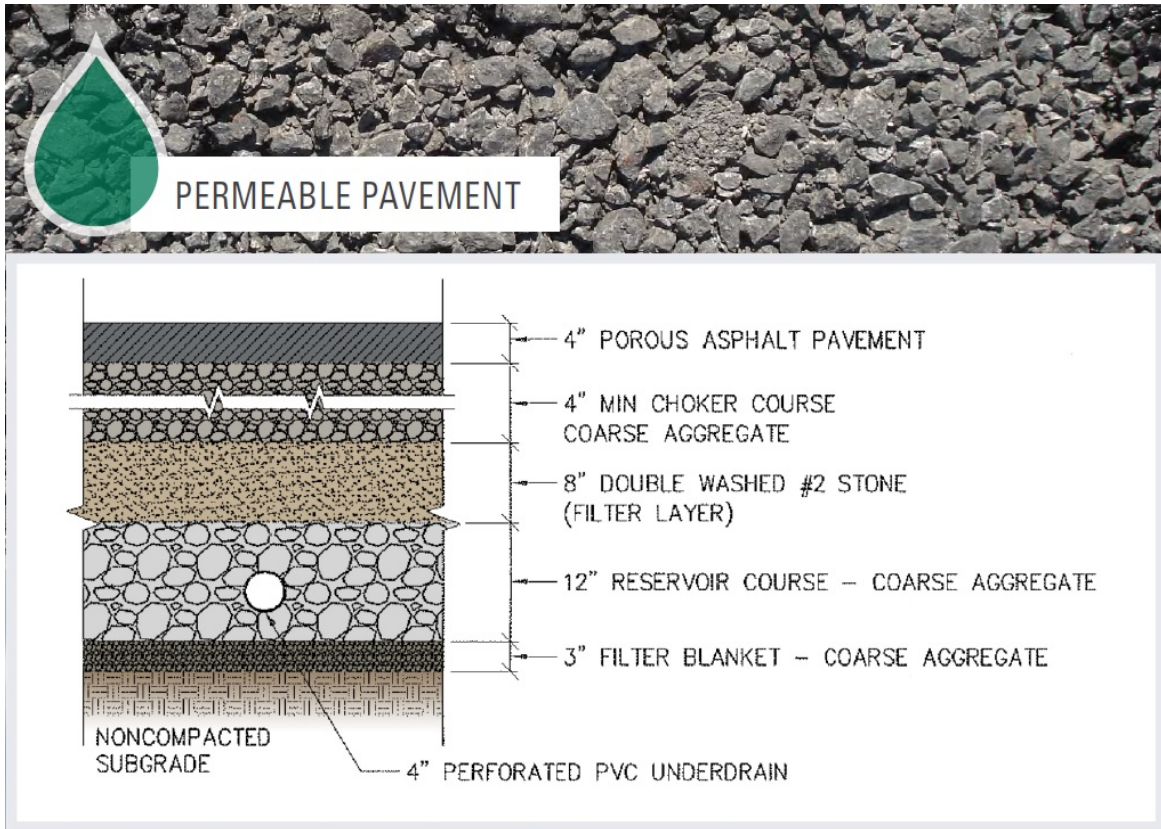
Example of pavement having asphalt as the surface layer with its subsections
